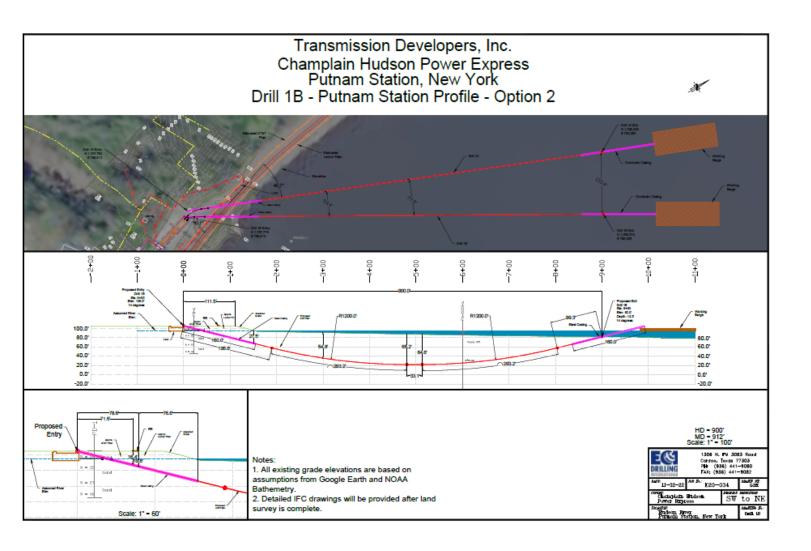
HDD Plan and Profile Drill - Putnam Station, NY
